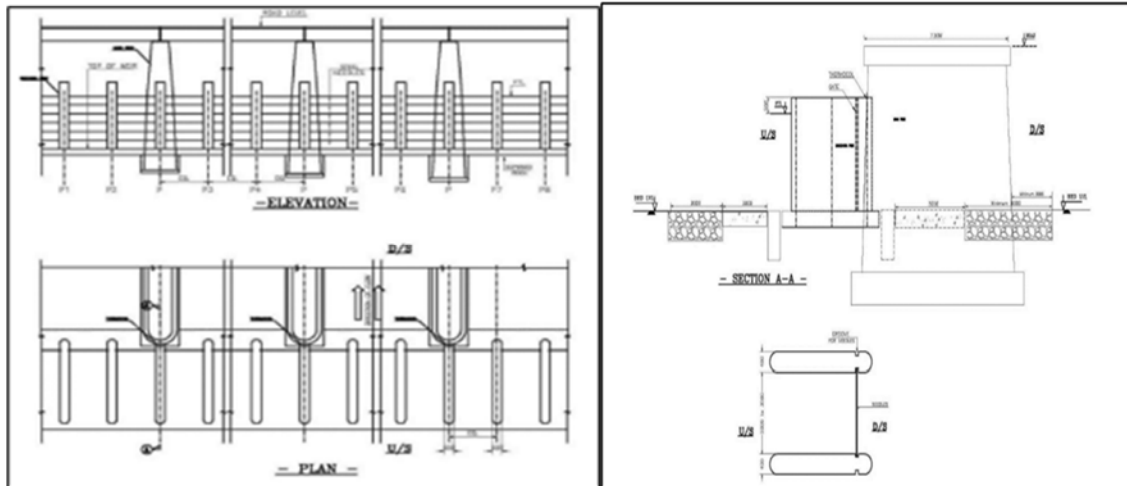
Typical Arrangement of Bandhara/Barrage Structure (Ingle, 2016)
